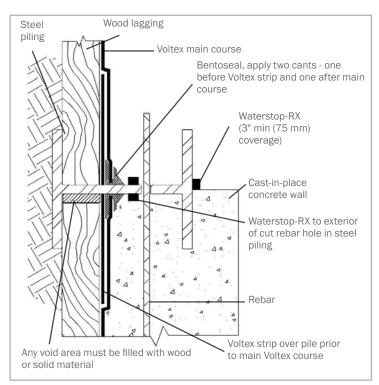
Lagging secured to inside surface of back pile flange. Install Bentoseal and Voltex strip prior to main Voltex course and inward Bentoseal cant. (Plan View).
